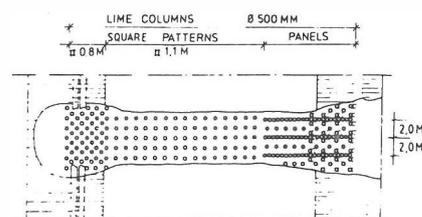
Layout of the lime column installation and the preliminary volume of EPS fill.
